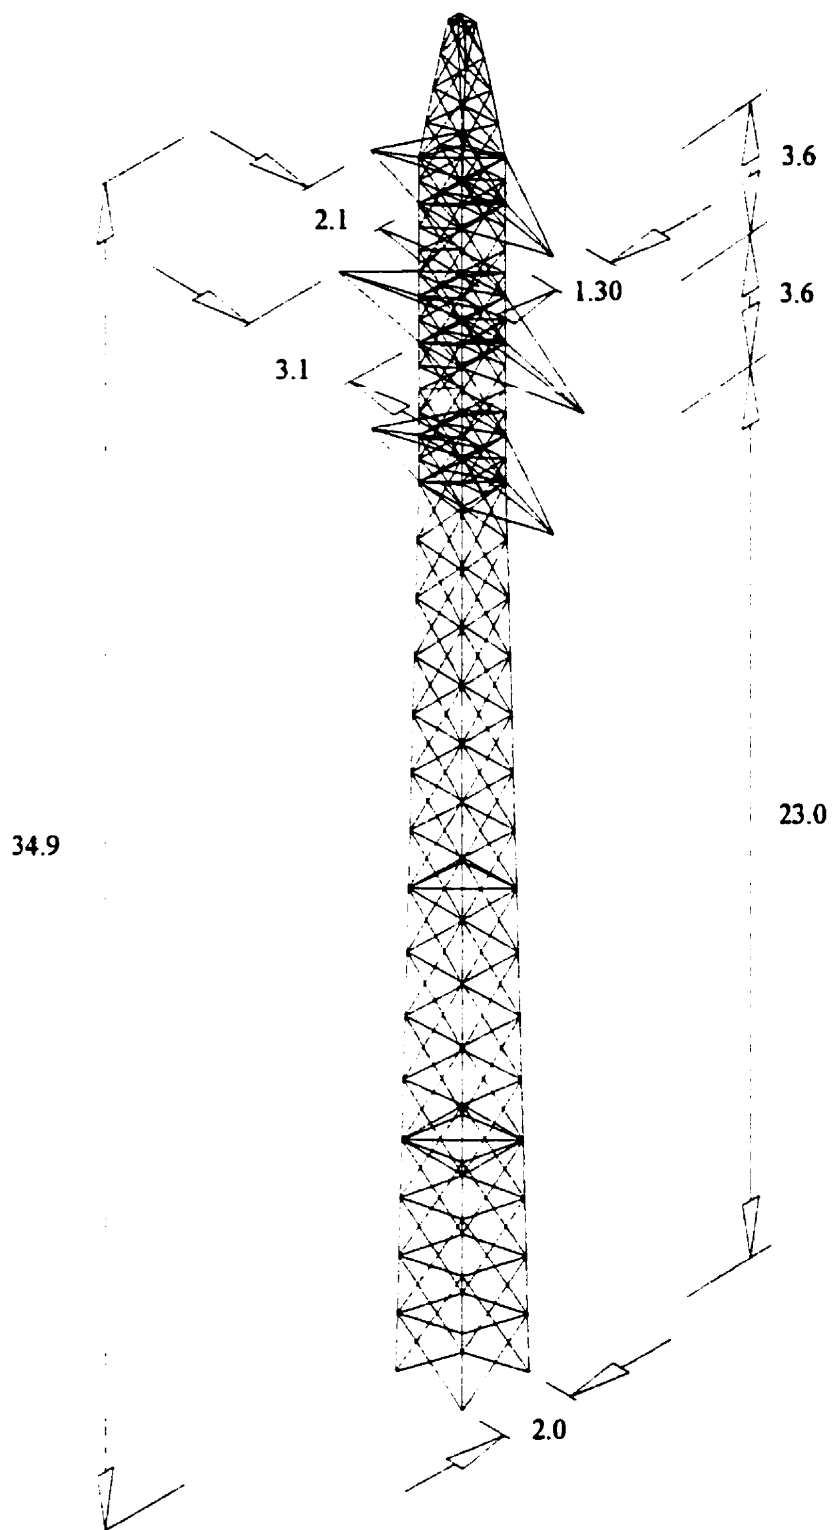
Layout of tower TR1 (dimensions are in m)
